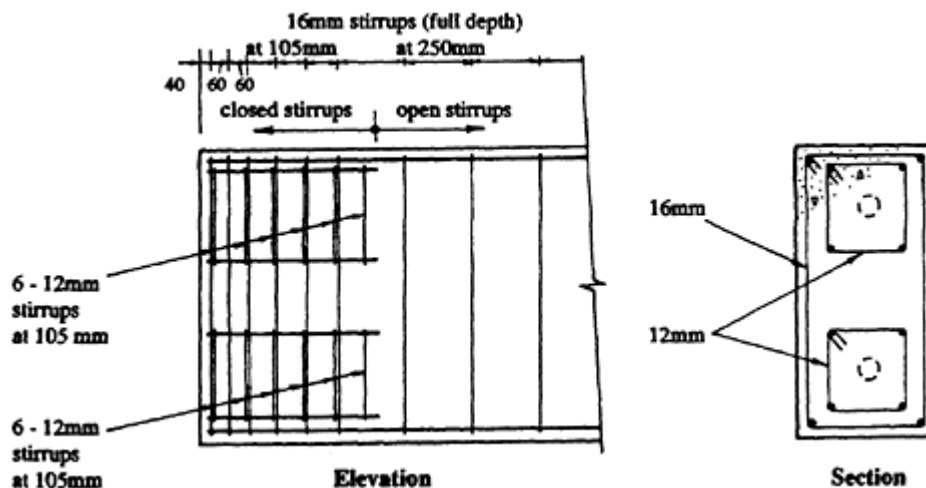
Reinforcement details for anchorage zone of [Example 6.2](#).
